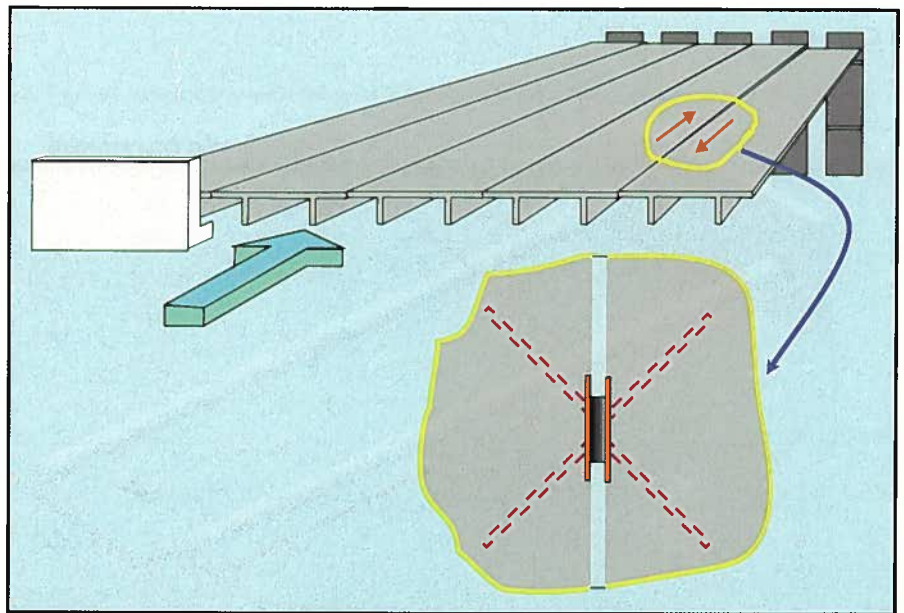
Precast, prestressed double-tee floor system with mechanical connectors.
